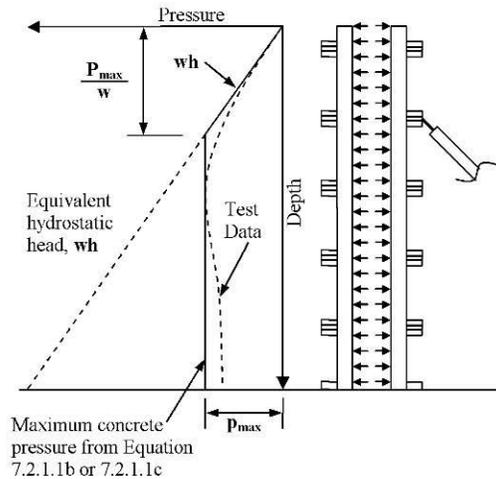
Concrete Lateral Pressure on Column and Wall Formwork
